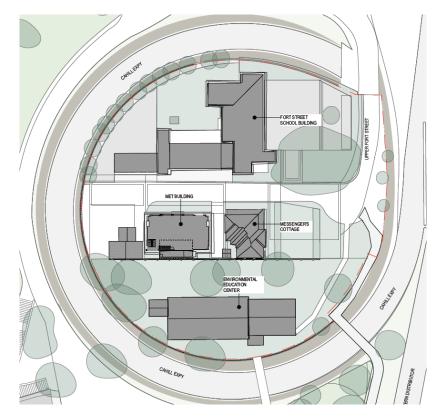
Site Plan- Existing (Source: FJMT DWG DA-1201, 18.10.19)
